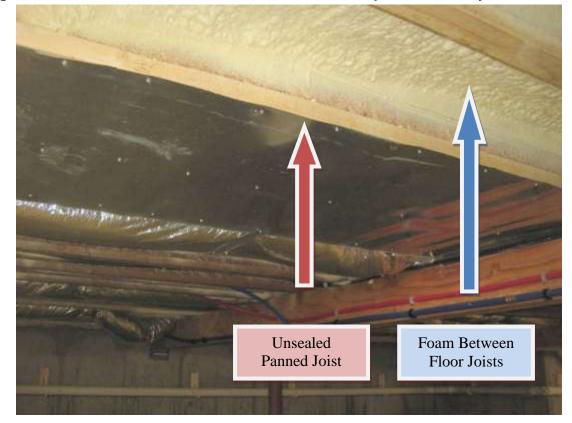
Foam Frame Floor Insulation over Crawl Space with Leaky Panned Joists
